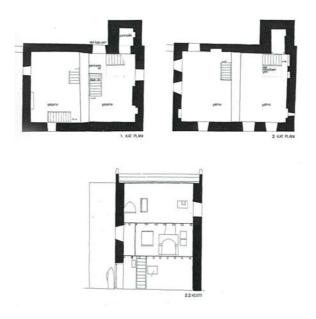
, Plan and section of a tower house in Bodrum (Bektaş and Başak, 2004, 98)
